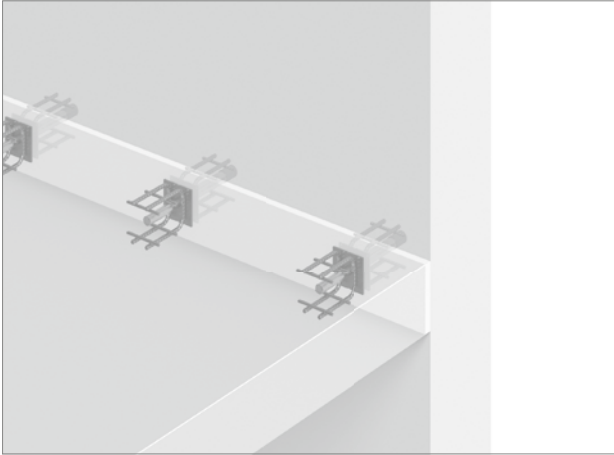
Schöck Stacon® type SLD: slab-wall connection
